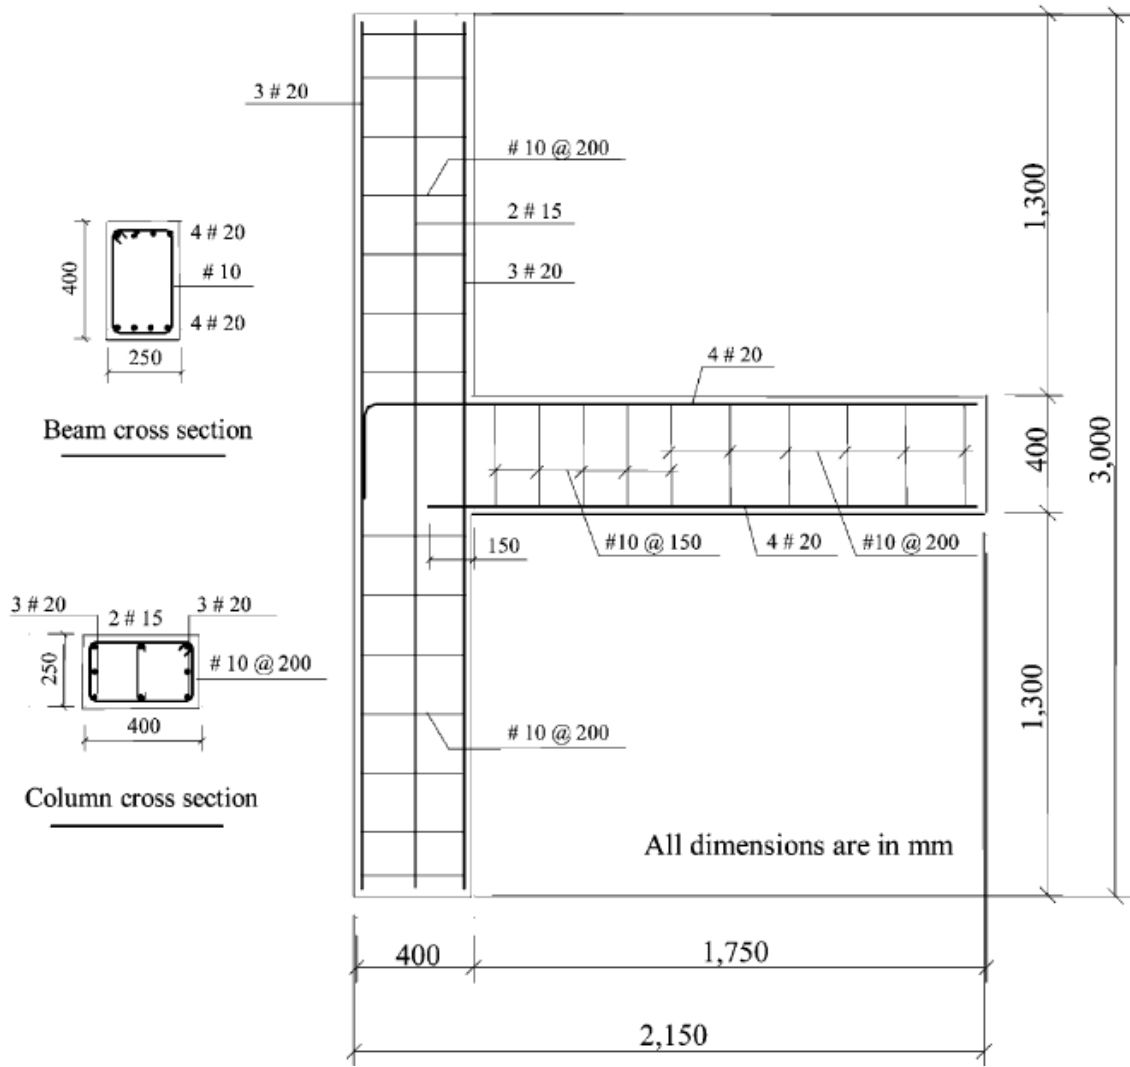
Specimen dimensions and reinforcement details [El-Amoury and Ghobarah 2002]
